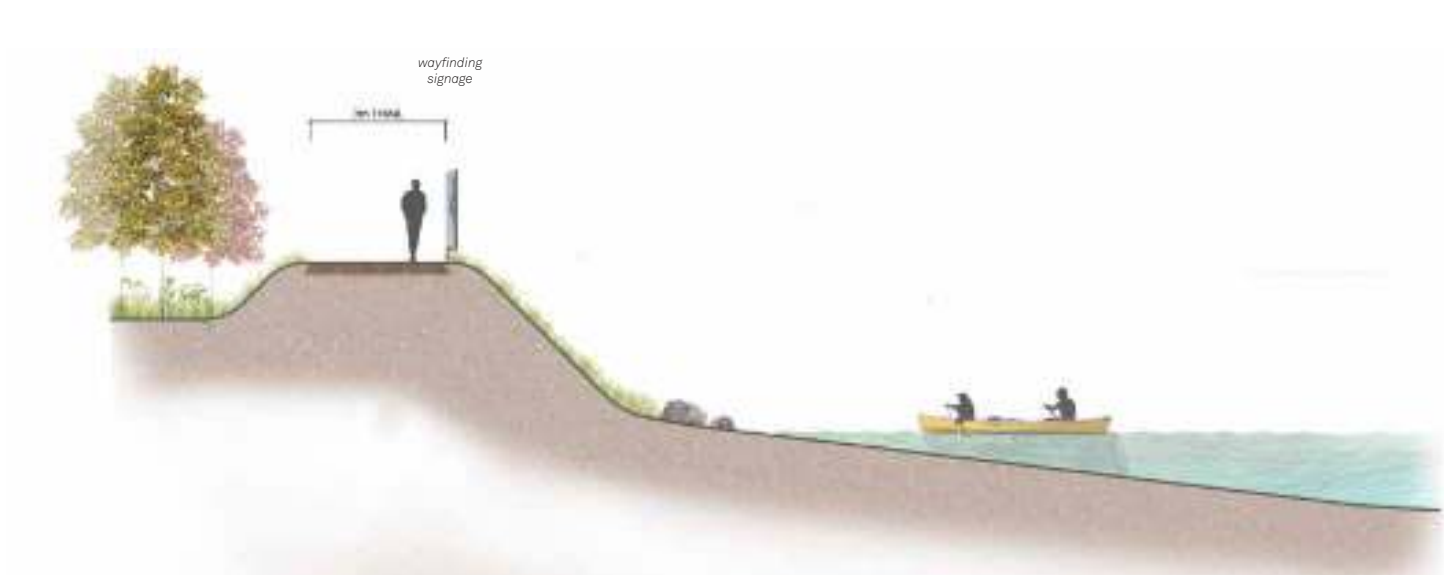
Proposed trail condition - where relevant with minimal intervention.
